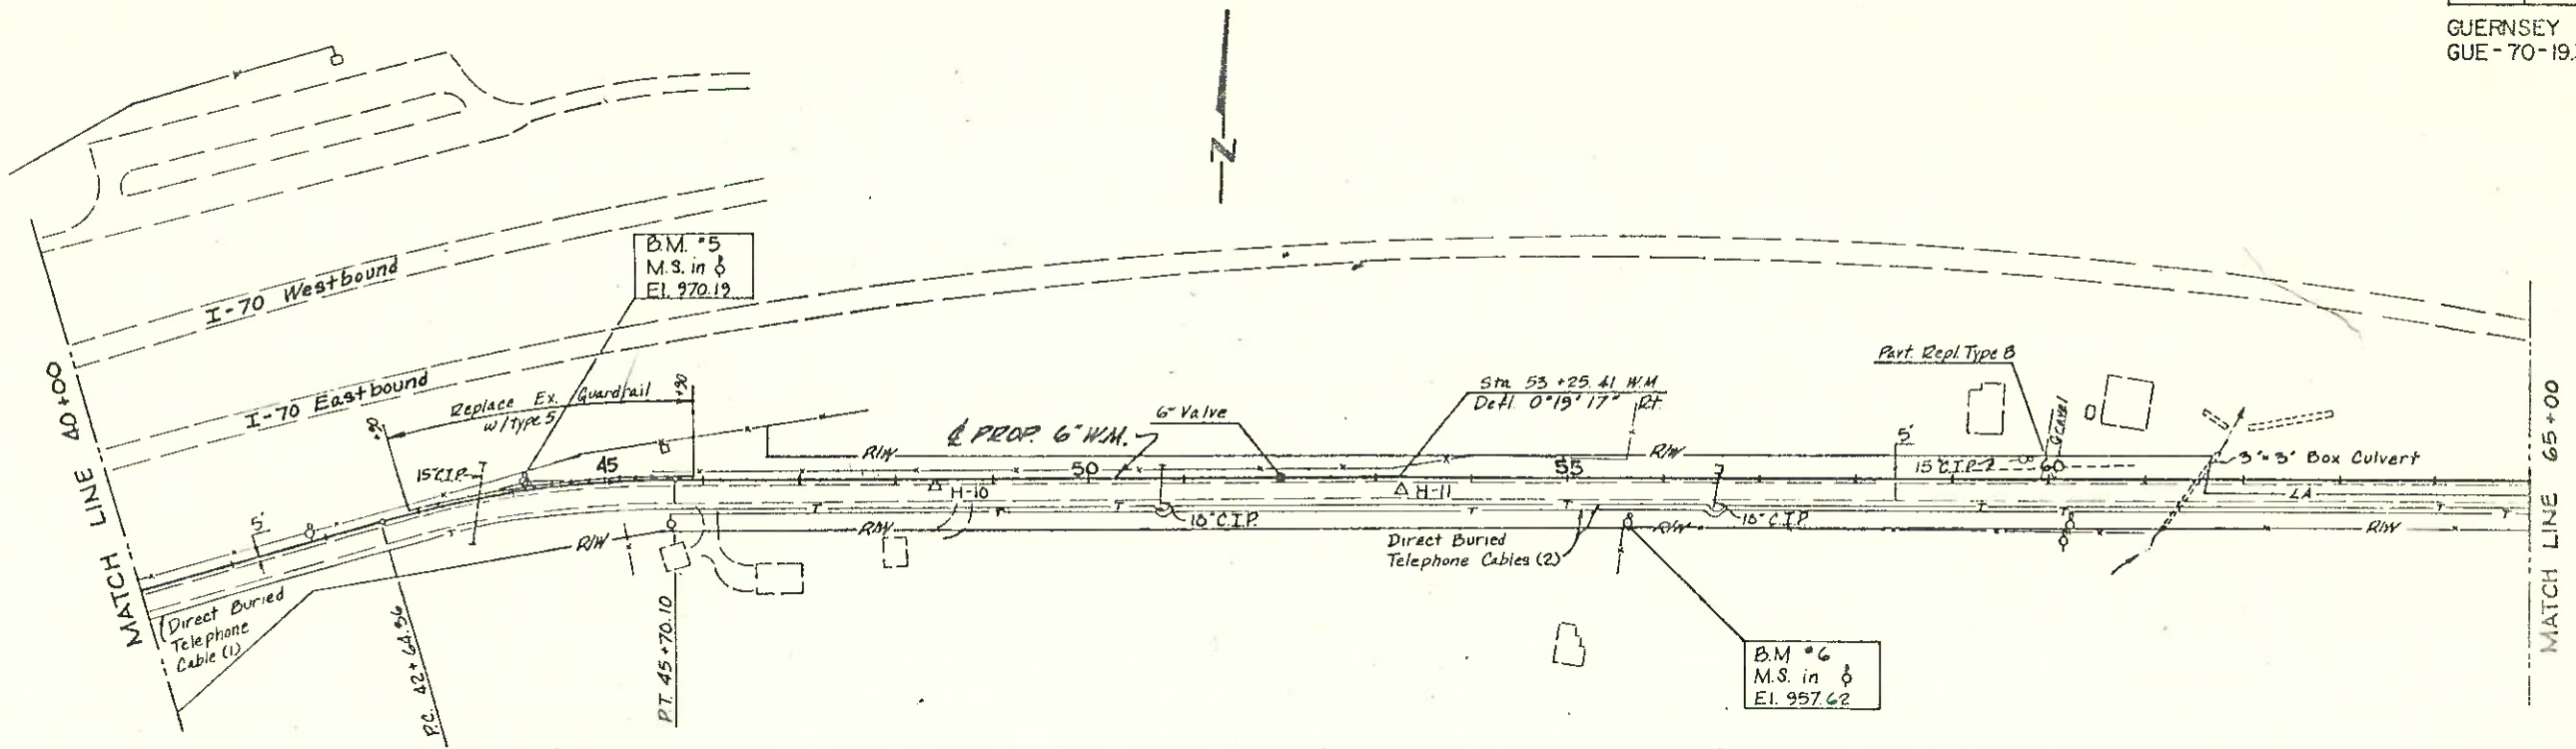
SINGLE PLAN AND CROSS SECTION-FULL LINE
